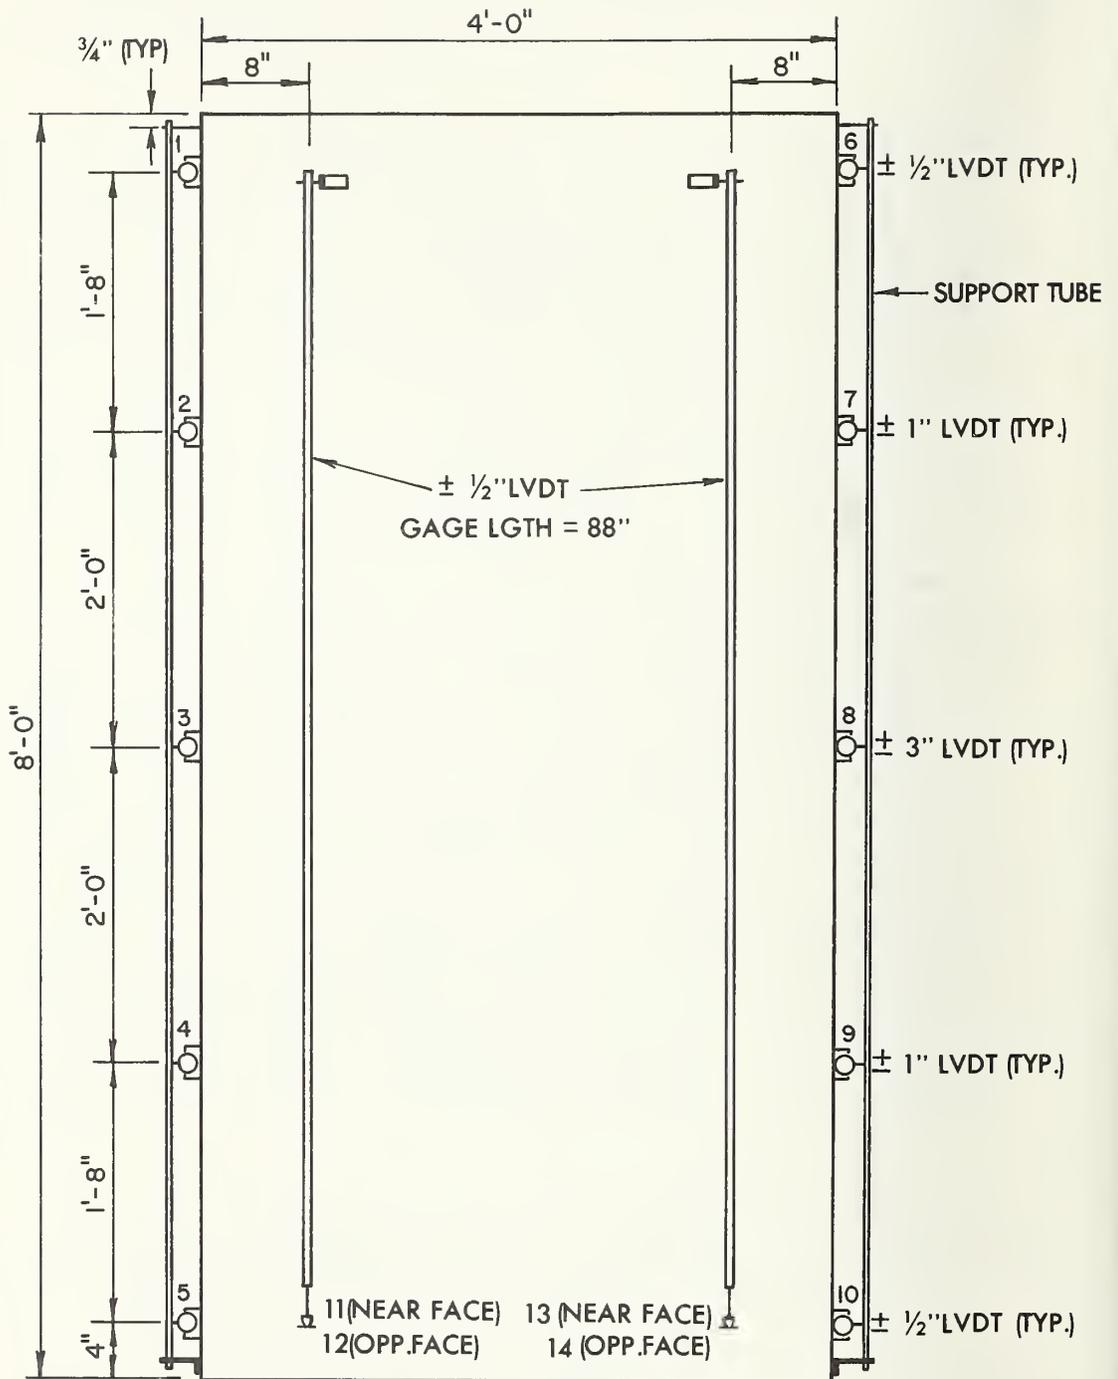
Instrumentation setup for measuring wall shortening and deflection.
